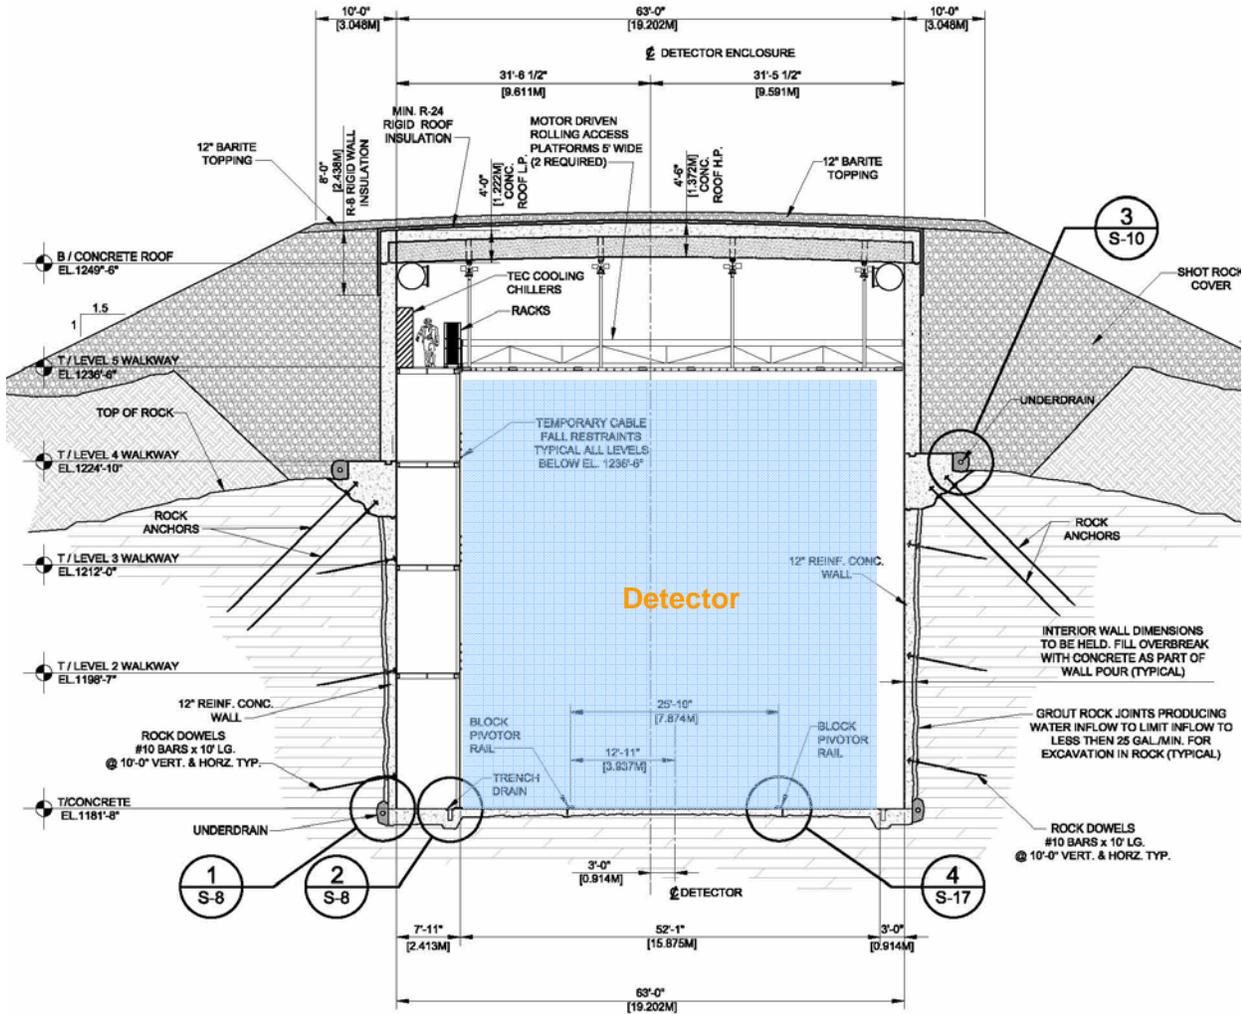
Typical Cross Section of the Detector Enclosure
